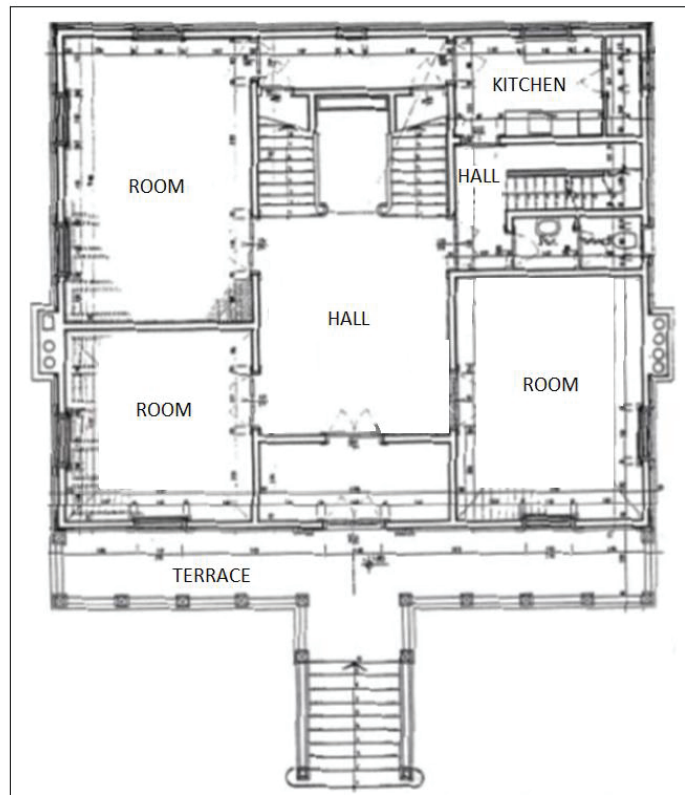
Ground floor plan of Şukru Bey. (Source : Ateş 2008)
